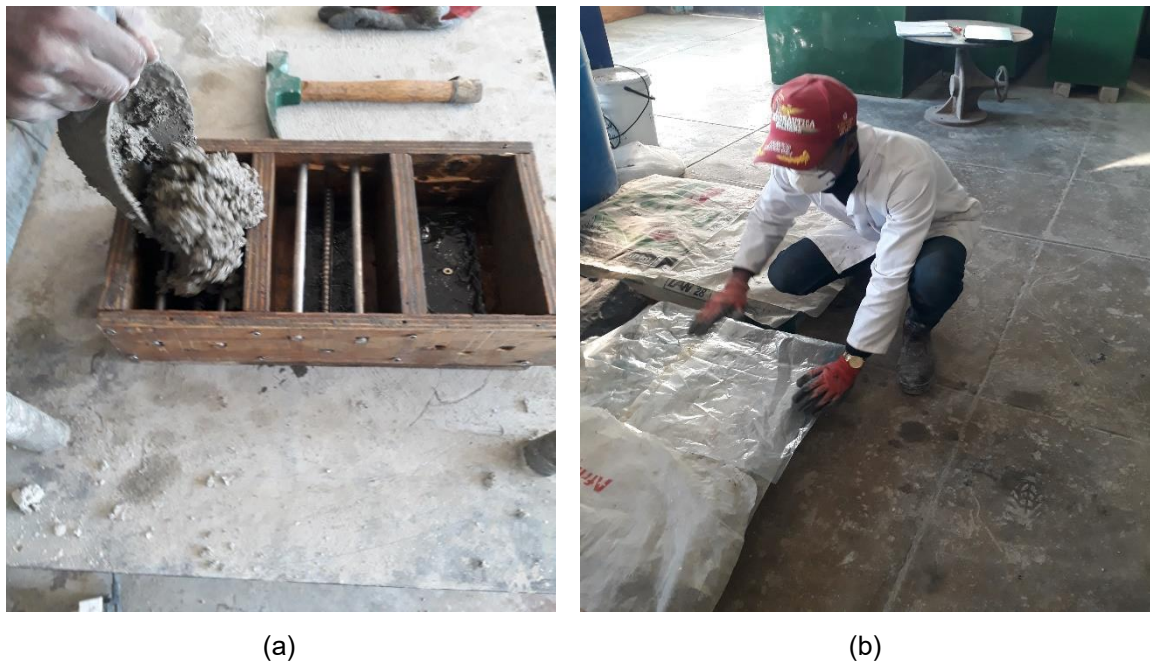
Photograph showing (a) the direction of casting of corrosion specimens and (b) polyethylene covering
